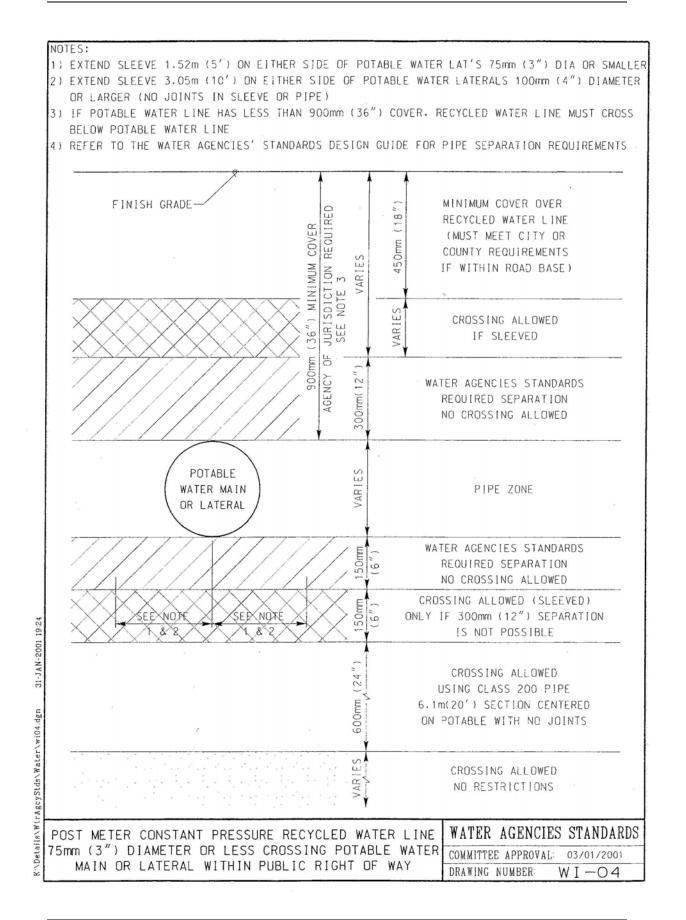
### DETAIL FOR CONSTRUCTION OF CROSSING PIPES AND/OR UTILITY TRENCHES
